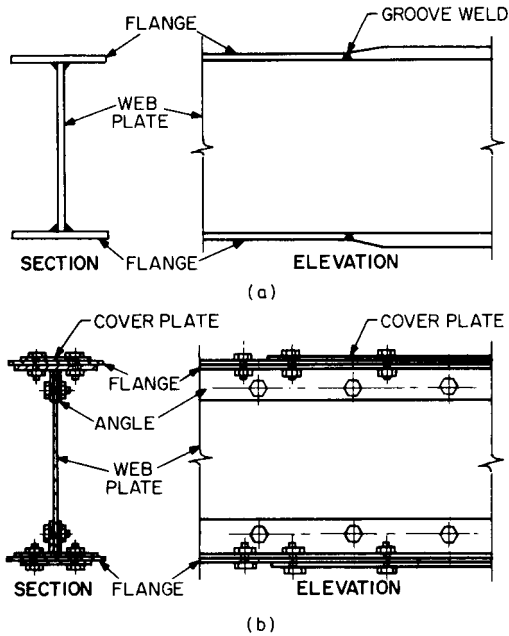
Plate girders: (a) welded (b) bolted.
